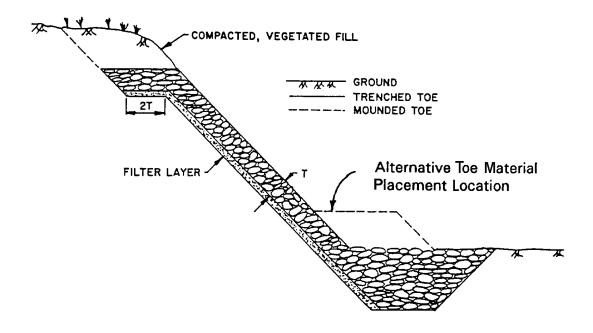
Typical Riprap Installation: End View (Bank Protection Only)
